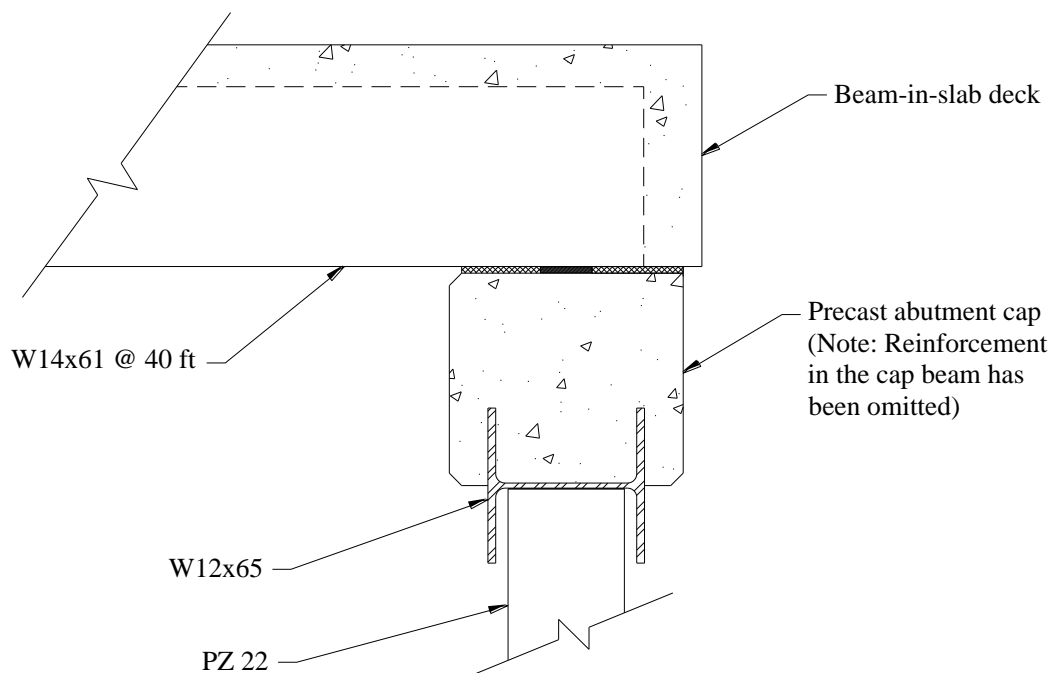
Precast abutment cap and contact between bridge deck, abutment cap, and sheet piling foundation in BHC, Iowa demonstration project
